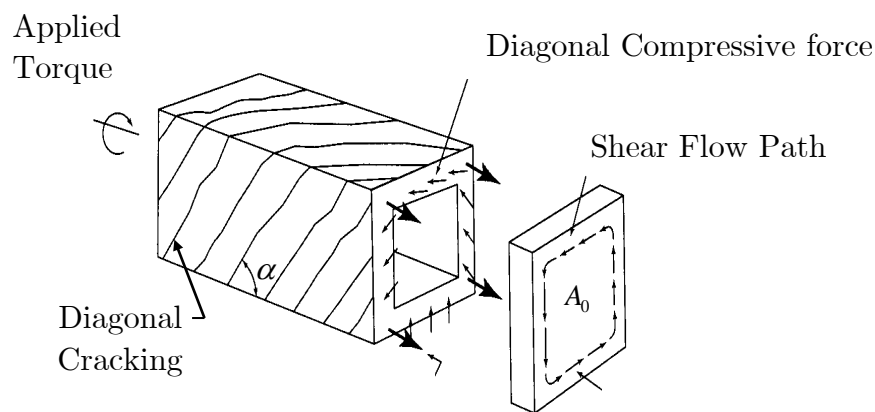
Cross section of shear panel and crack pattern developed under torsion
